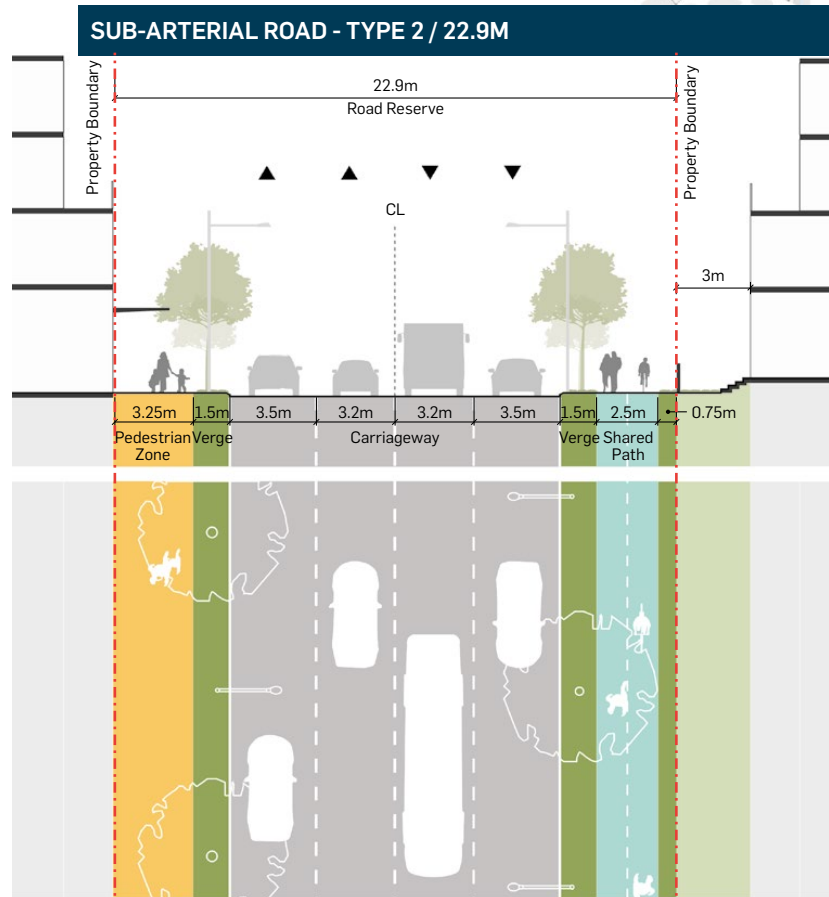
Indicative Street Section A-A' - Sub-Arterial Road - Type 2
